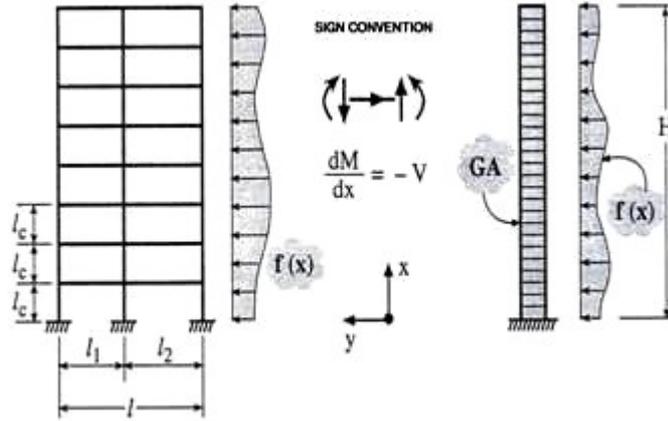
Continuous Shear Beam Model of Framed Structure [2]
